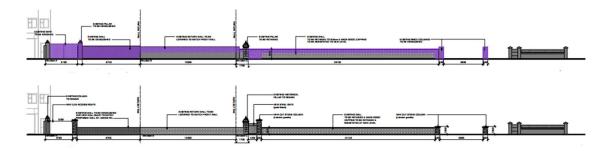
Extract from Architect's Drawing No. P19171D-210 showing proposed works to Boundary wall on St Agnes' Road.
